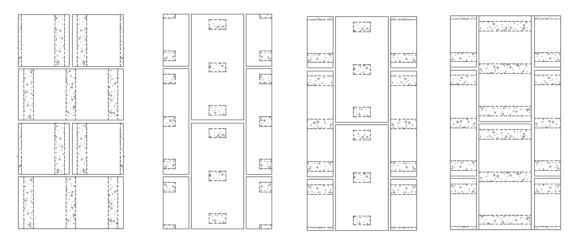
Prism cross sectional views: (a) P1-P9 (b) P11-P15 (c) P16-P20 (d) P21-P30
